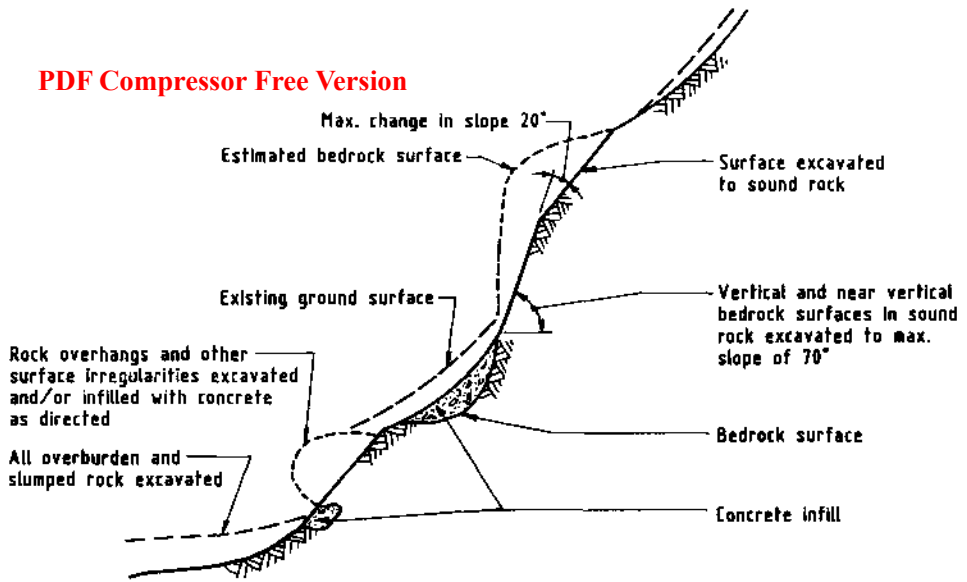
Mica Dam foundation excavation, typical excavation detail (Pratt et al. 1972).
